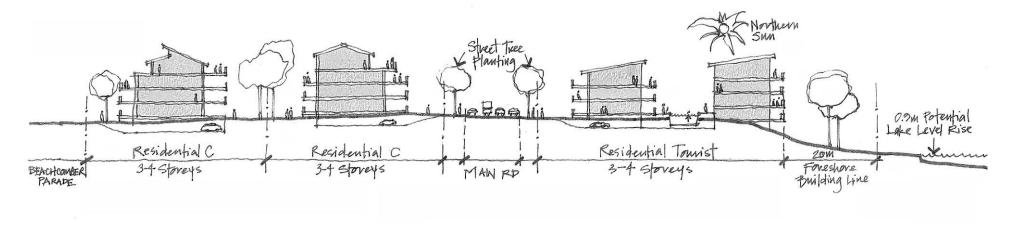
Indicative Section through Precinct 2 – West Toukley and Beachcomber
